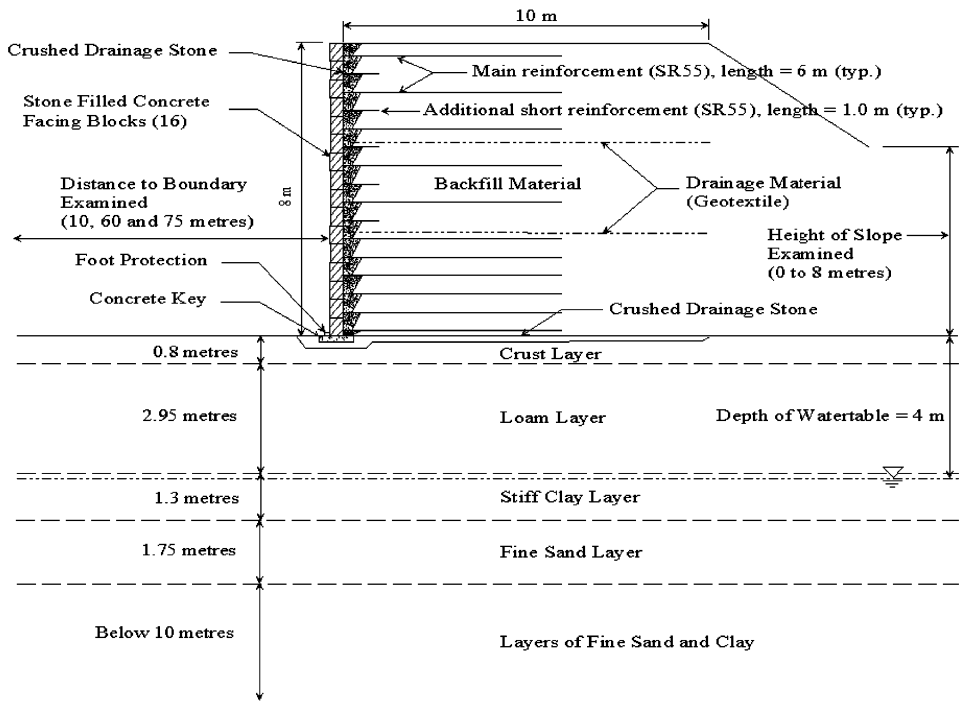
Cross-section of wall (adapted from PWRI 1997).
